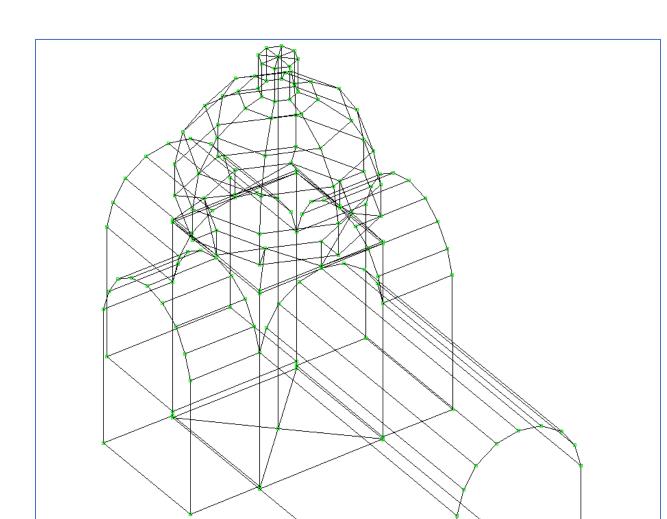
SJD08 Barrel Ceilings East and West Rooms
